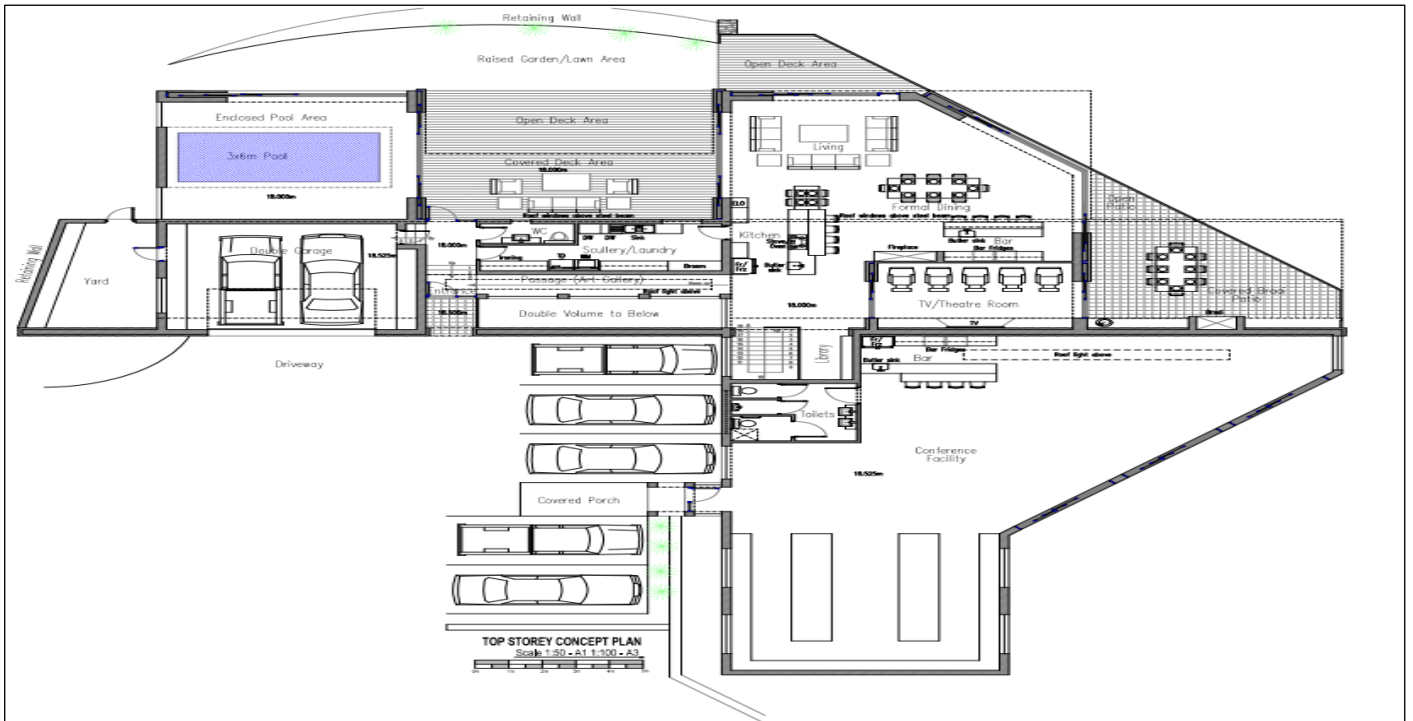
Concept plan for the first floor of the proposed conference centre and tourist facilities (TMBA, 2023)
